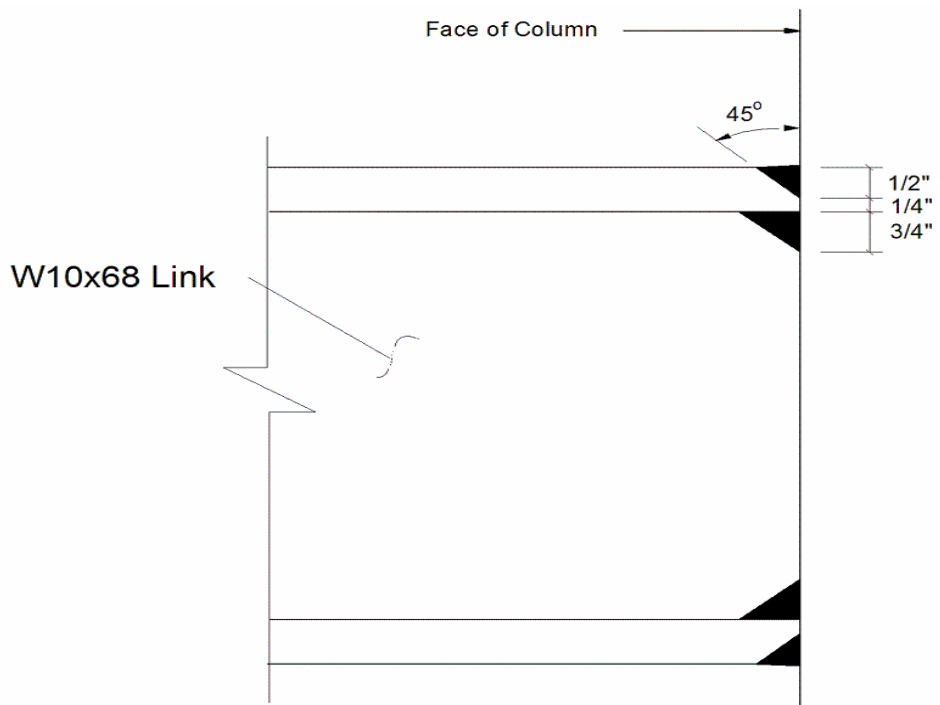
Specimen AISC-4 – Link End Preparations and Welds
